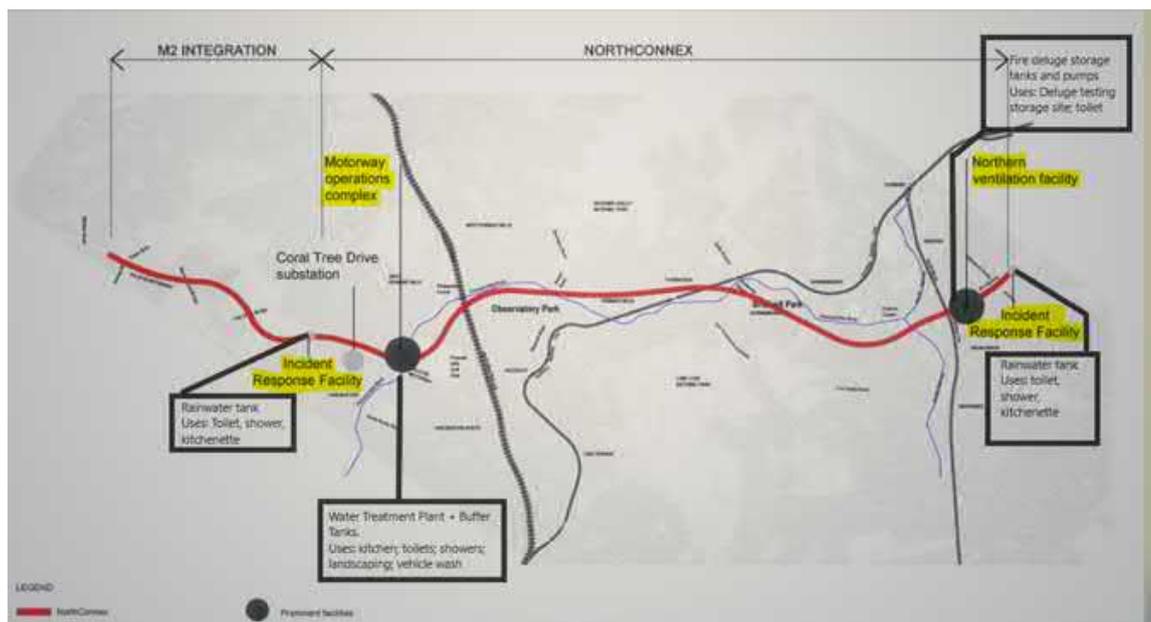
Location of water uses, water storage and treatment plant in NorthConnex (source: NorthConnex Urban Design and Landscape Plan Stage Two, 2018)
